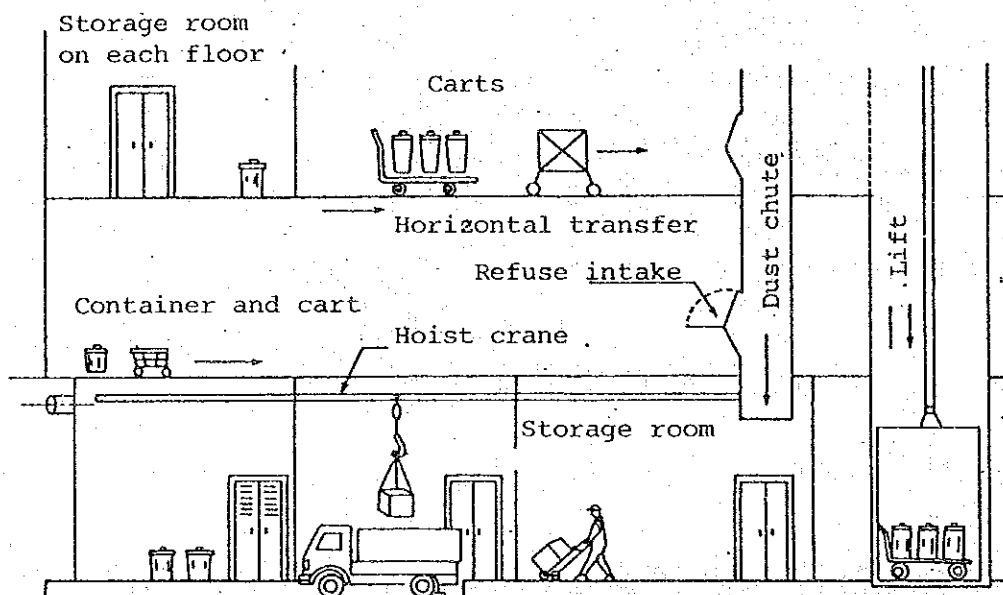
Solid Waste Disposal System in Buildings
